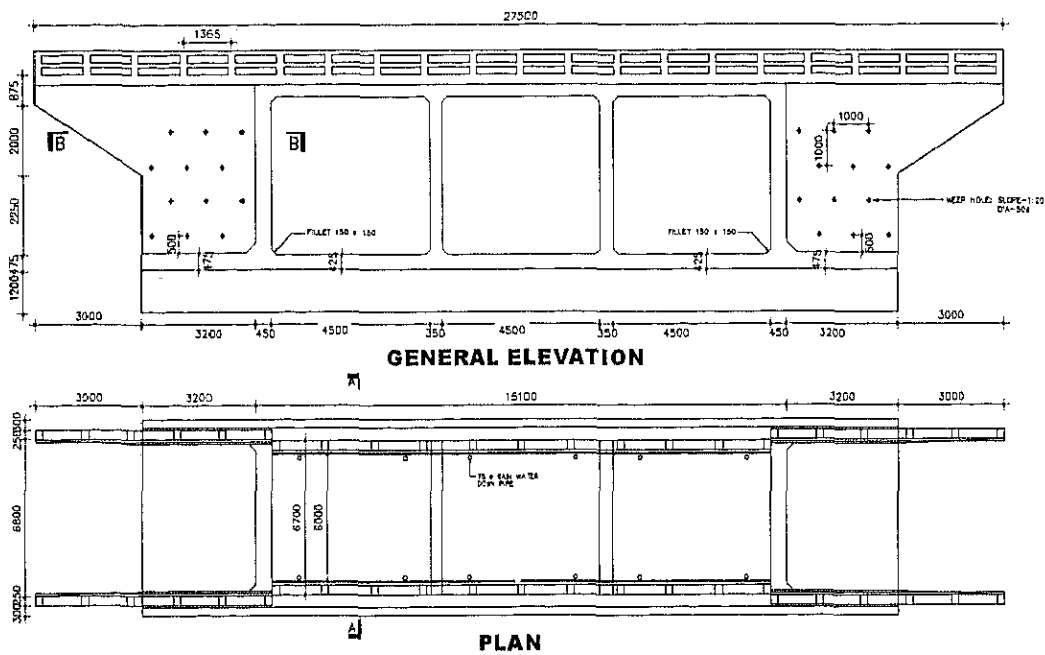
Plan of RCC bridge with double lanes (Upazila road)
